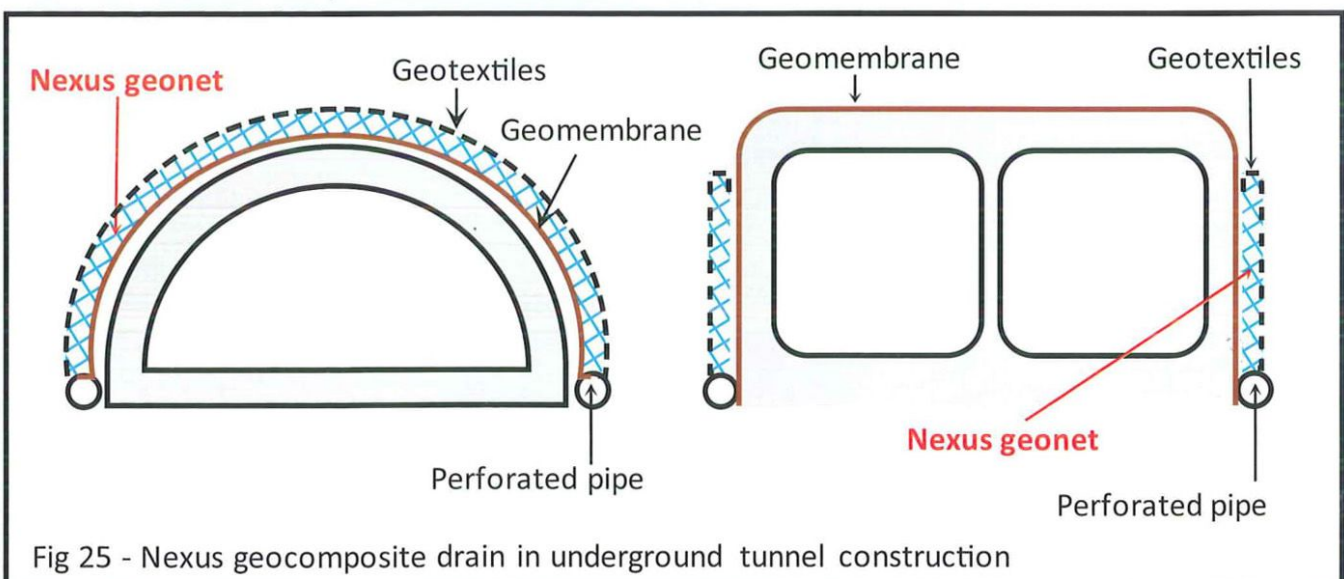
Nexus geocomposite drain in underground tunnel construction
